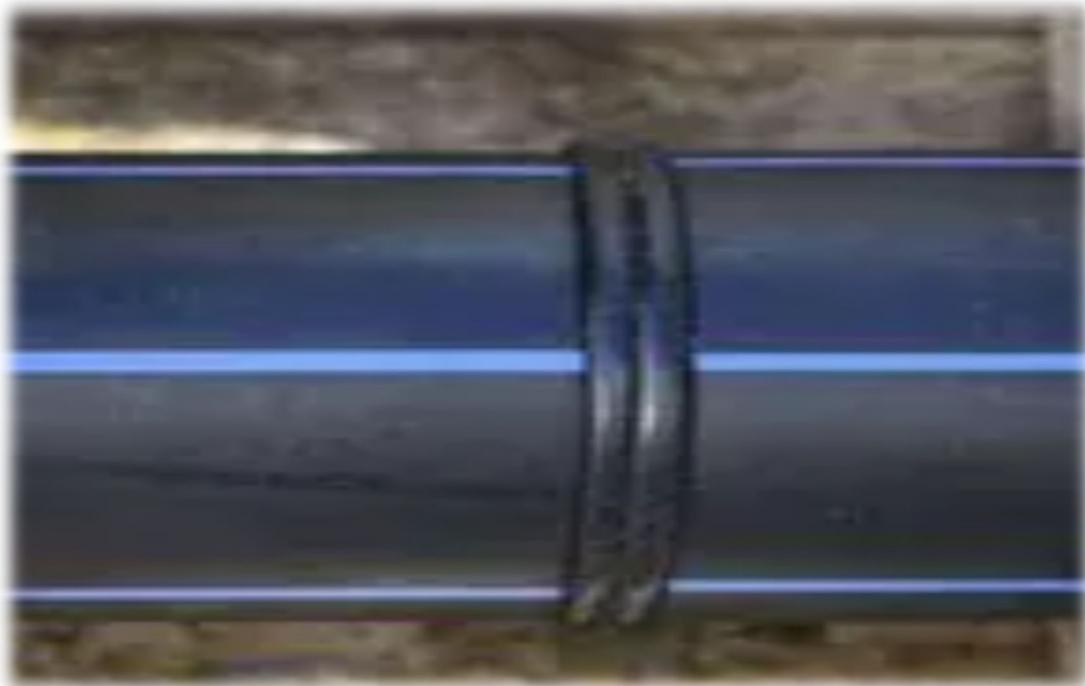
Fusion ring at each butt weld joint of the siphon pipes
